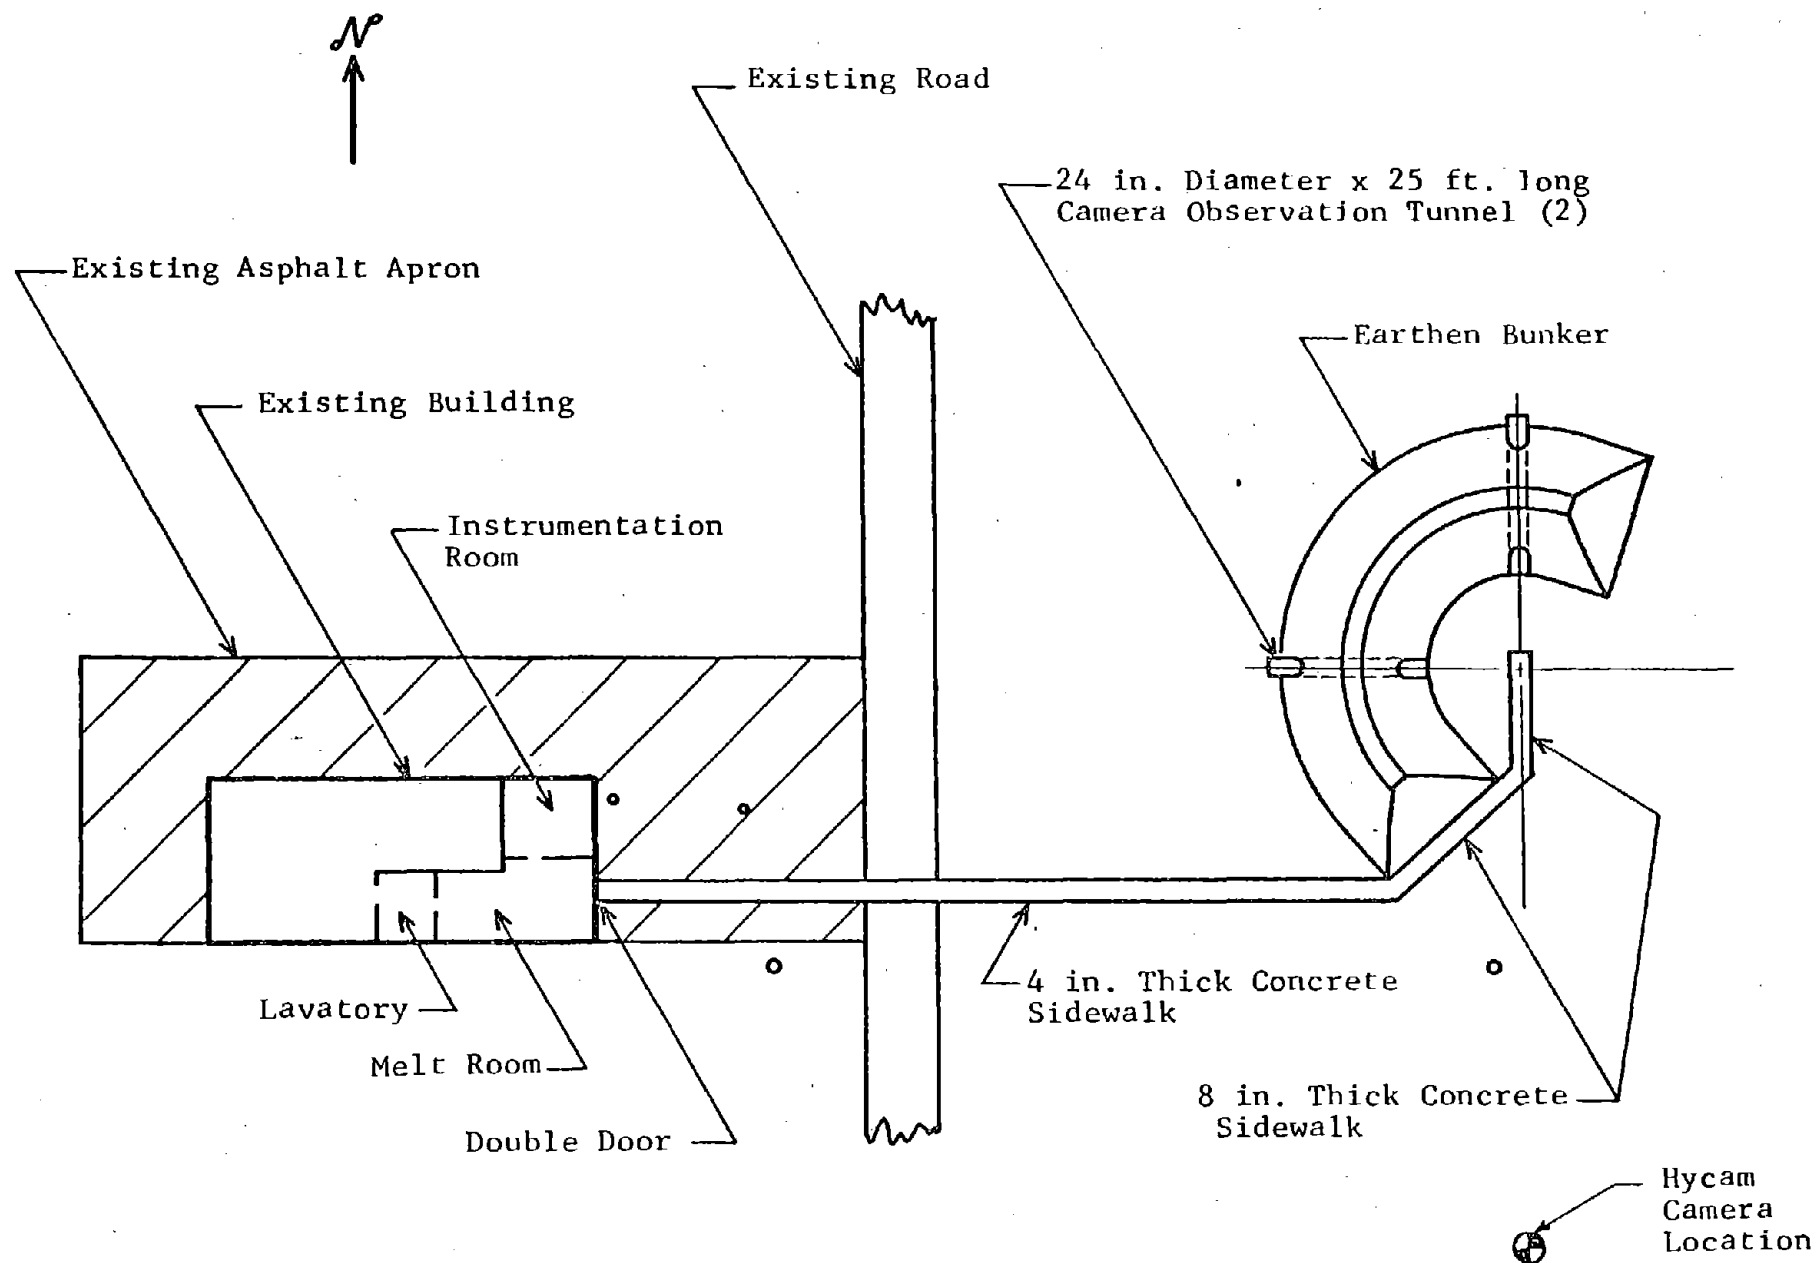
Plan View of Melt/Detonation Facility at Burning Area Unit Y-8, Kingsbury Ordnance Plant.
